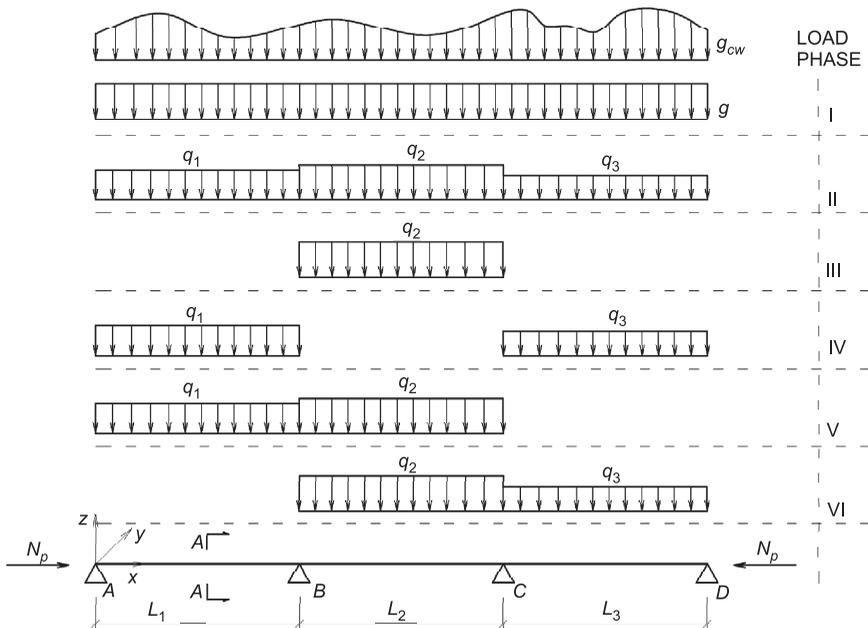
Static diagram and configuration of external forces for a three-span beam
